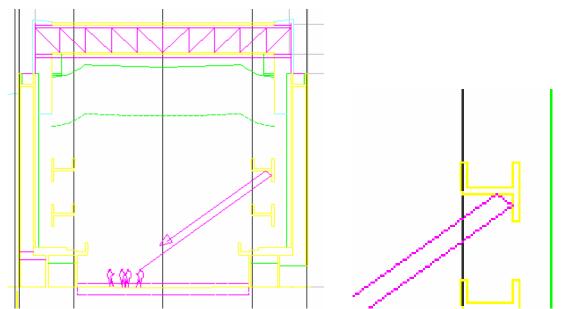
short section of the Concert Hall, showing the reduced, more intimate parterre and the stepping out of the hall at first balcony level, as well as the free-hanging balconies and the movable ceiling (lowest position dotted line, highest position full line). The right image shows in more detail the downstands, and how the combined action of downstand and balcony soffit creates lateral reflections back to the main floor parterre. The shape of the downstand in plan will be variable so that further towards the back of the room the downstands will create improved reflections to the rear balconies as well.
